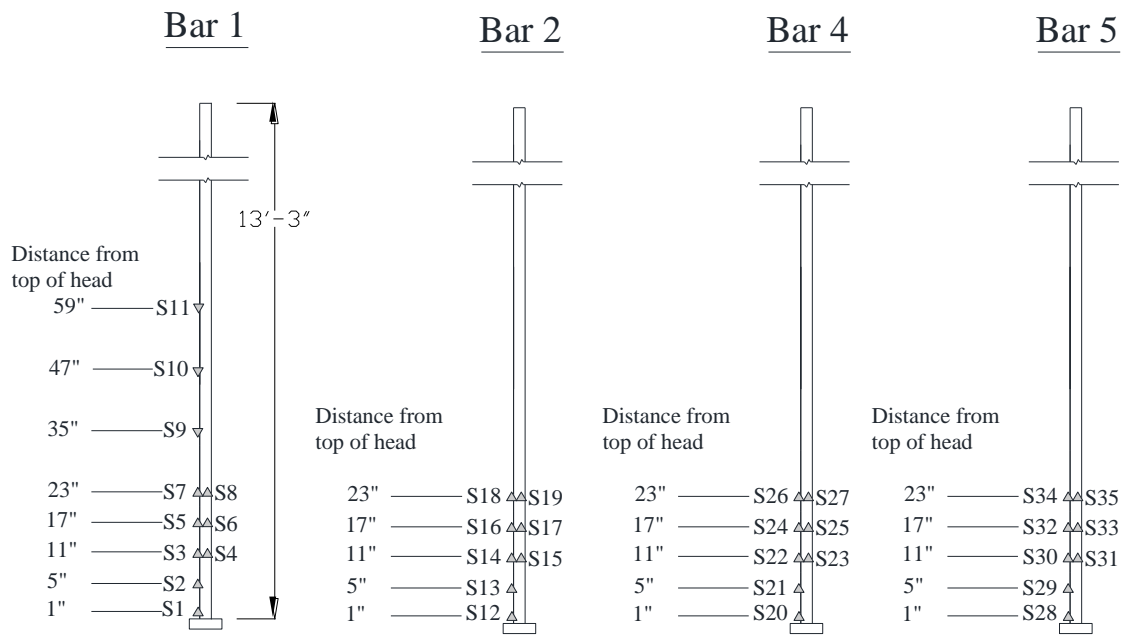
Elevation view of slab reinforcement at Section EE for Specimen #3
